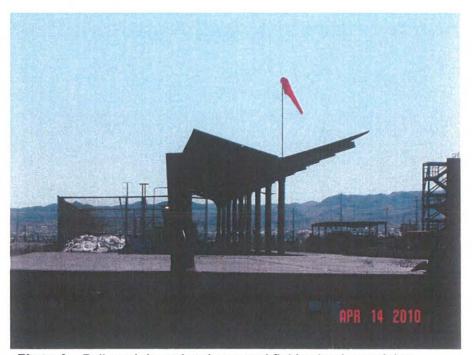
Rail road depot has loose and flaking lead containing paint.
